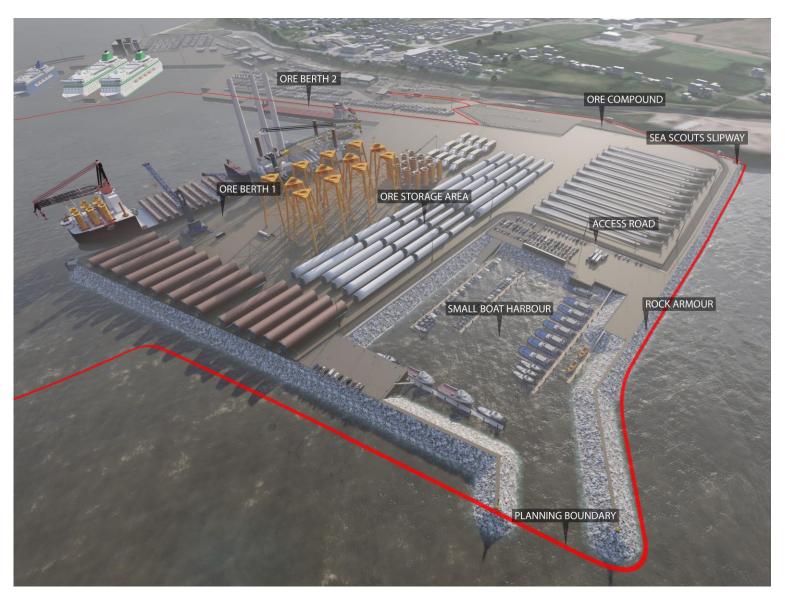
Example of operational layout for ORE Marshalling and Assembly (landward aerial view)
